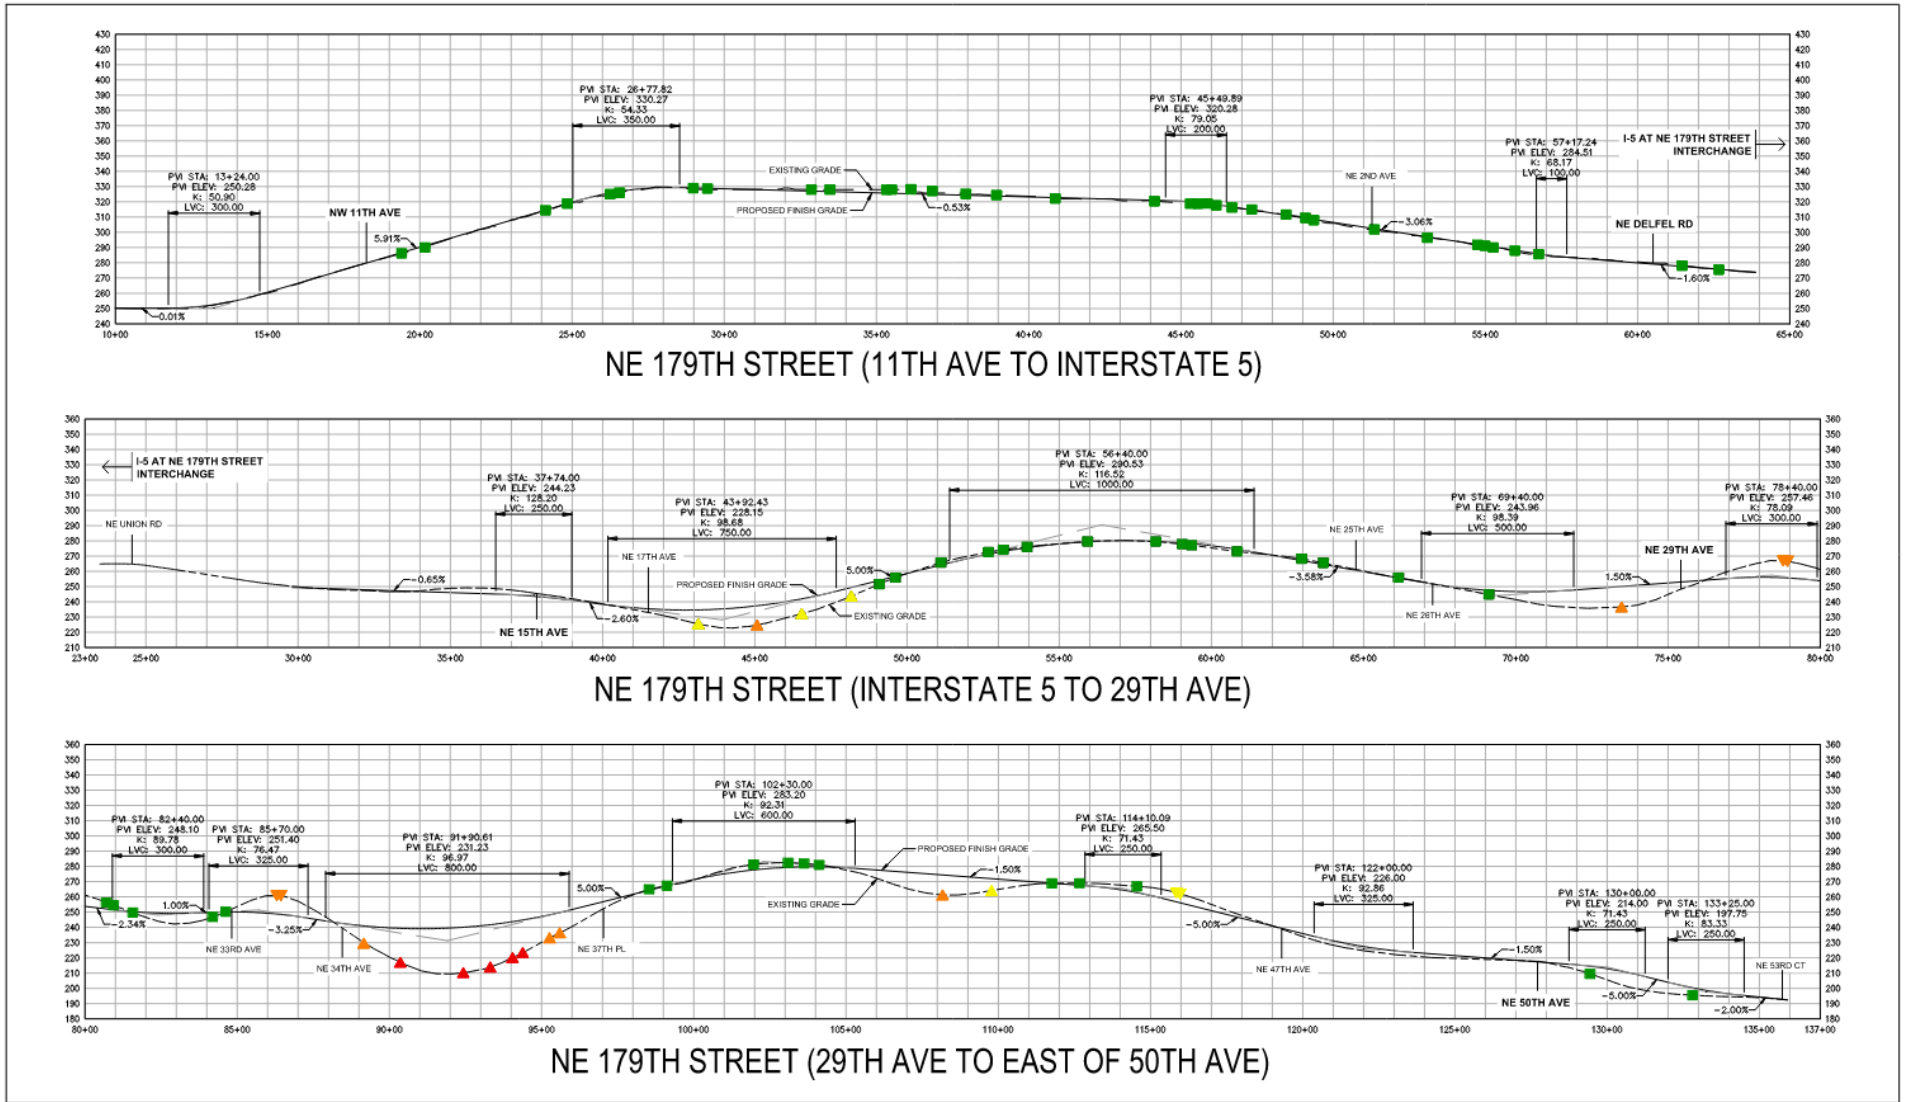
DRIVEWAY ELEVATION ASSESSMENT
